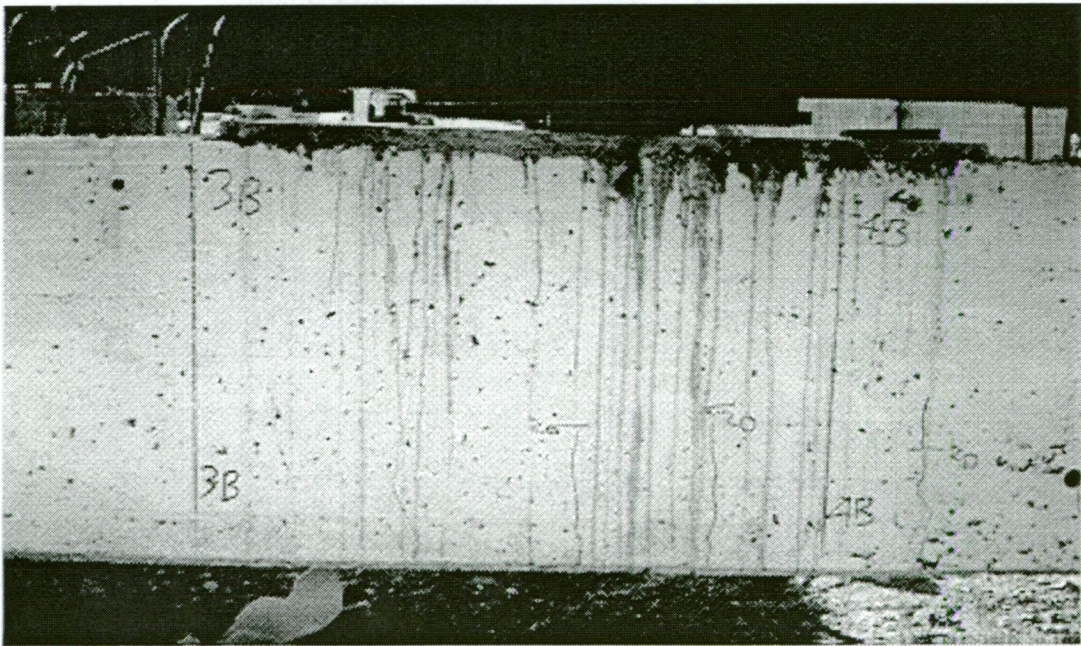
Flexural Beam Crack Patterns
